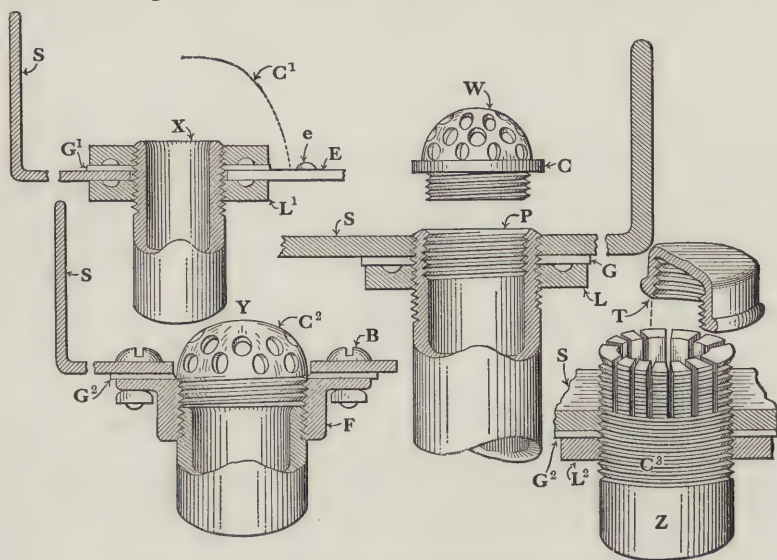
TANK SAFE PAN DRAIN PIPE CONNECTIONS
